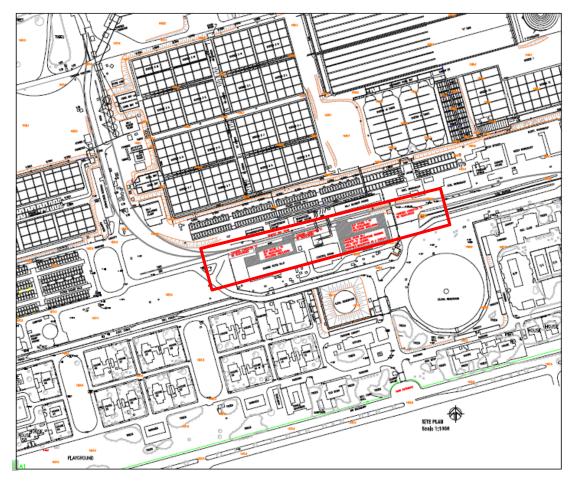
Above is a section of the layout of the rand Water facility as at present. The annotated areas are the buildings and facilities of interest. (RW Drawing)
